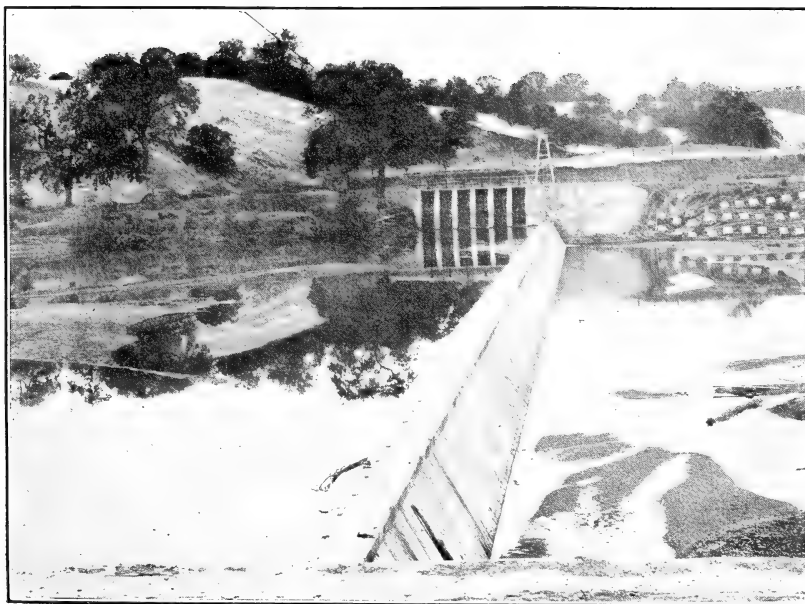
SPILLWAY OF DIVERSION DAM NEAR WOODLAND, CALIF
